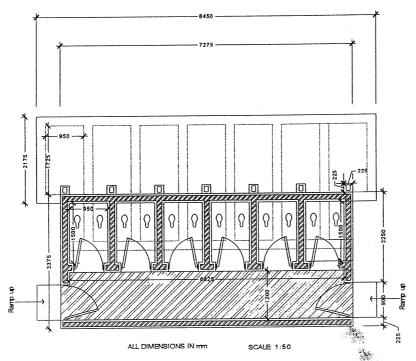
Floor Plan of the 6-compartment VIP Latrine
